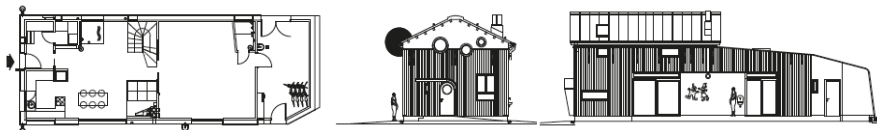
Ground floor and elevation (Architecture | Boštjan Debelak, Structural engineer | CBD d.o.o., Energy efficiency | low-energy, Surface | 142 m² Site area | 548 m² Construction system | solid timber Xlam construction, House technique | water-to-water, heat pump, floor heating, open fireplace)
